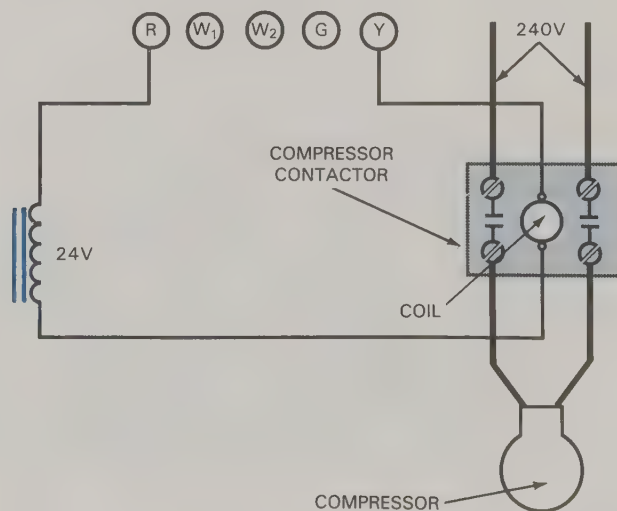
A heating-cooling thermostat controls operation of the compressor contactor coil.
